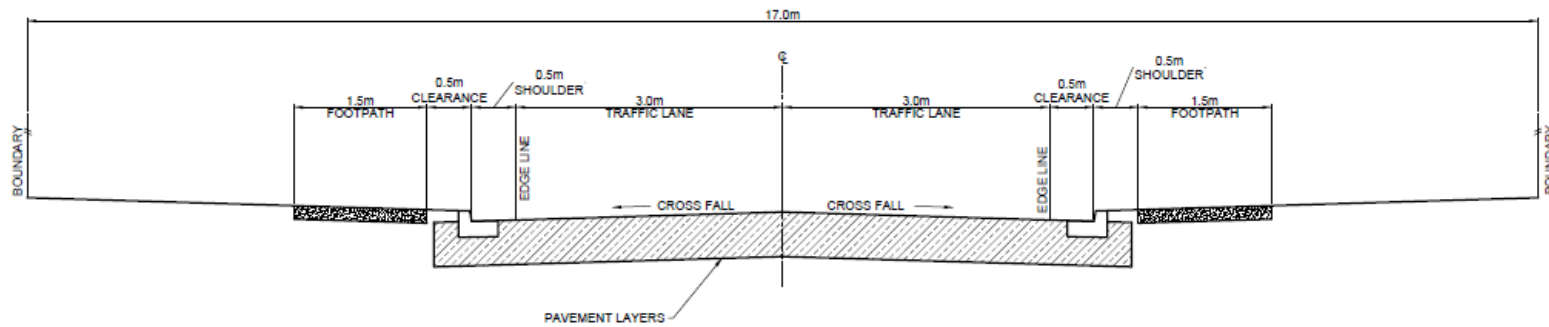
Tamahere RLZ – Rural lifestyle zone – road cross sections
